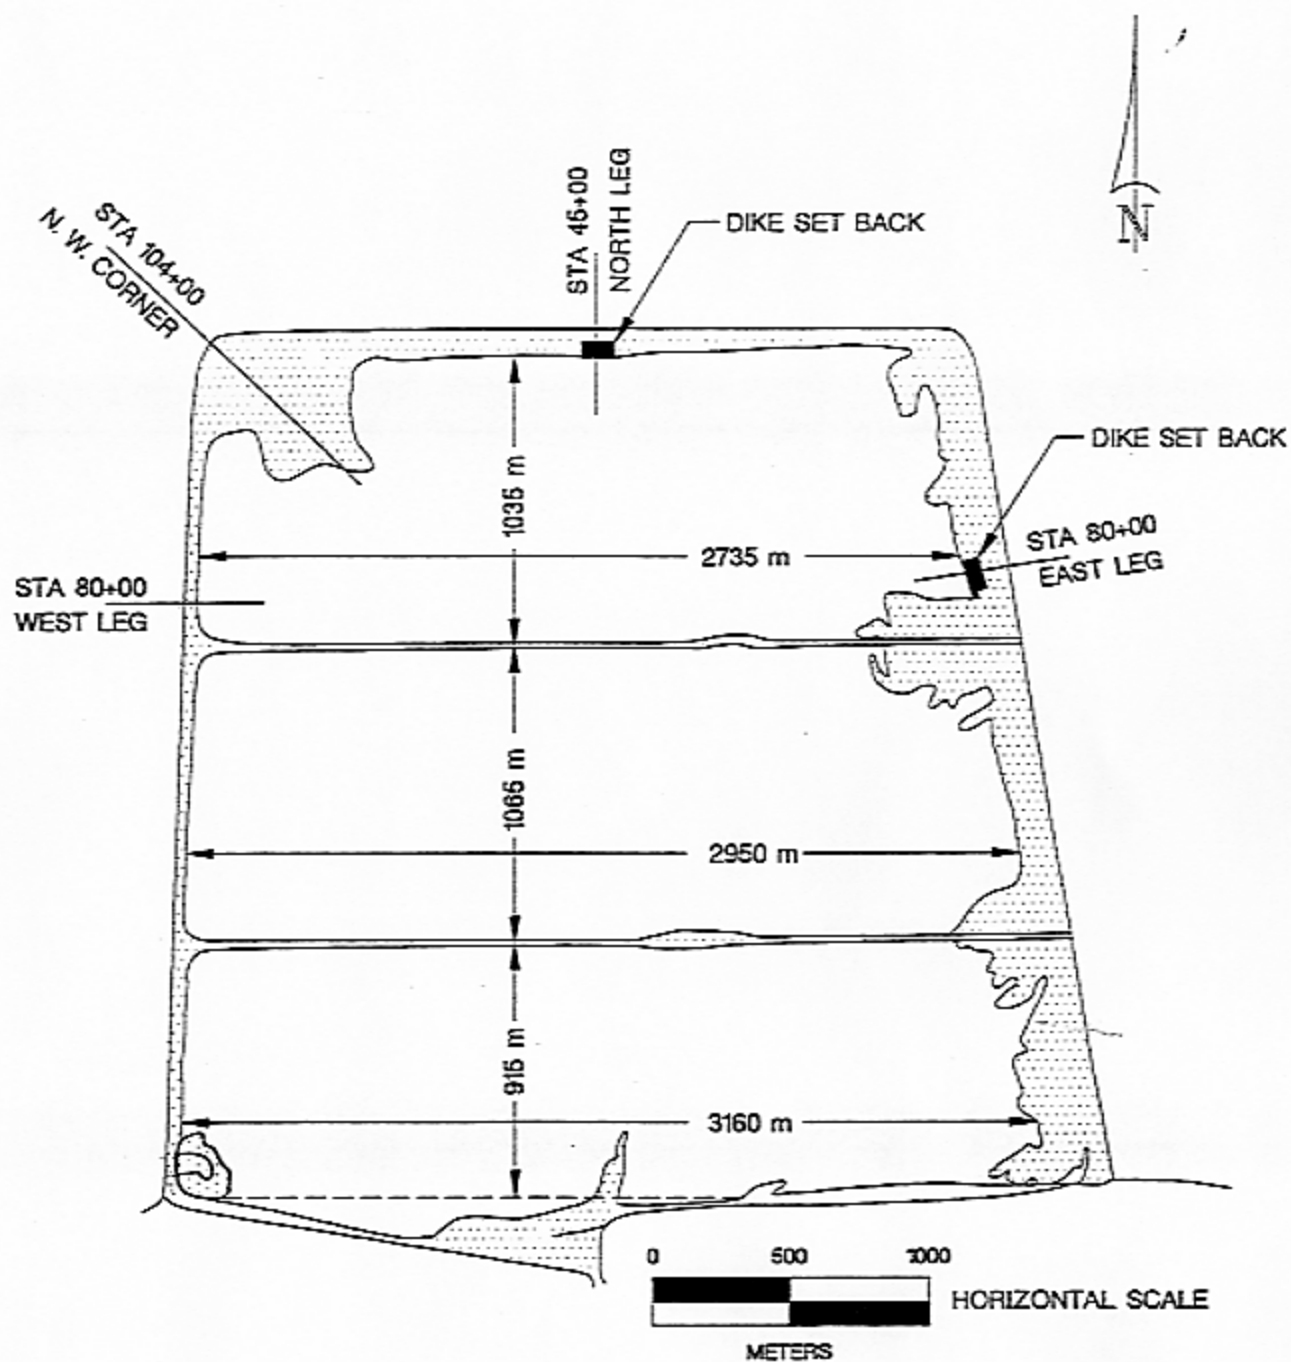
Plan View of Craney Island and Location of Dike Cross Section
